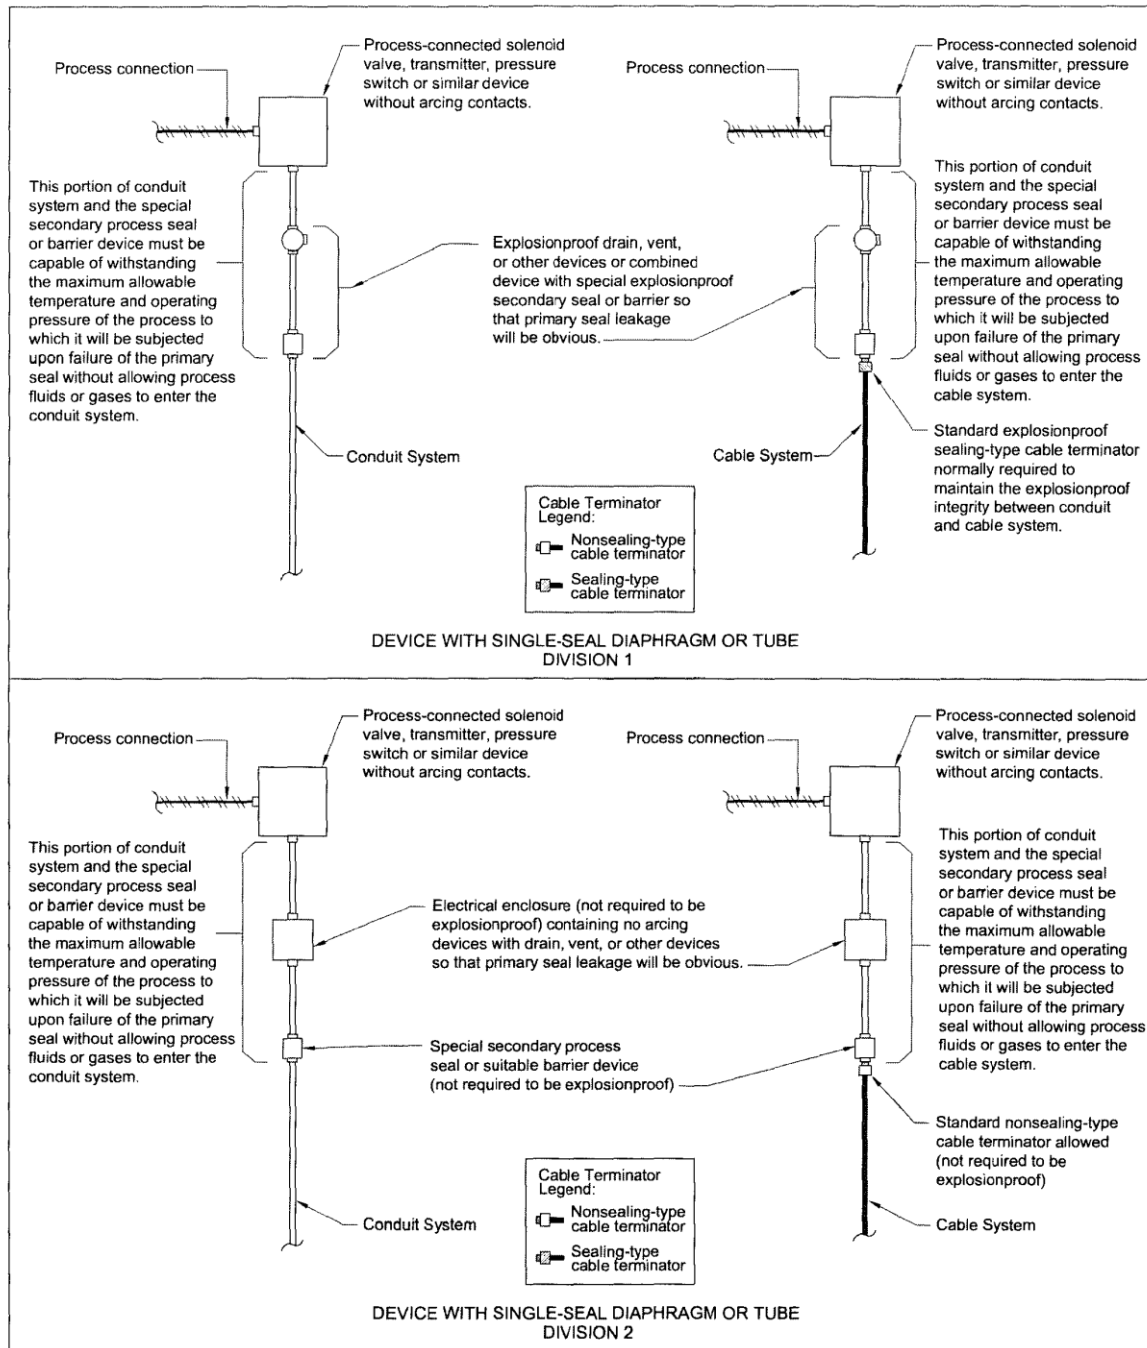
Typical Class 1, Division 1 or Division 2 Electrical Installation Conduit and Cable Connections to Process-connected Nonarcing Devices with Single-seal Diaphragm or Tube
